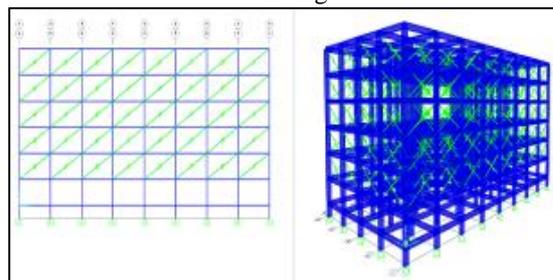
Elevation & 3D View of G+5 soft storey at ground floor.
